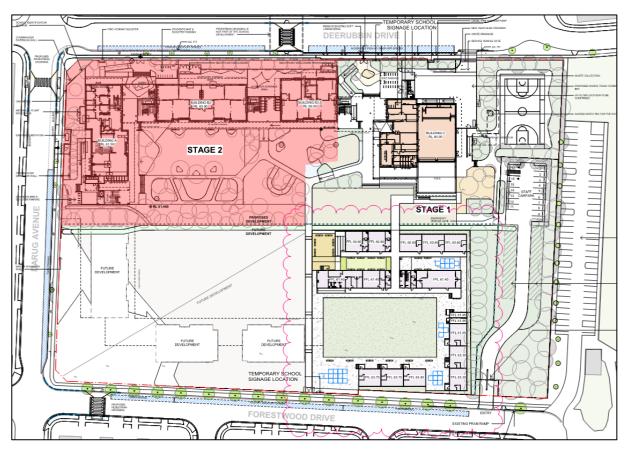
Updated Site Plan - New Public School at Mulgoa Rise
